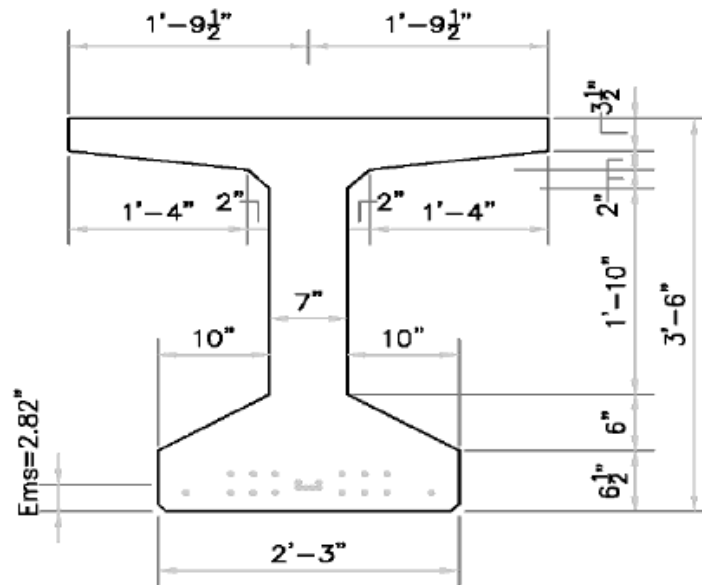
Colorado Bulb-Tee Test Specimen Dimensions (Matthews, 2008)
